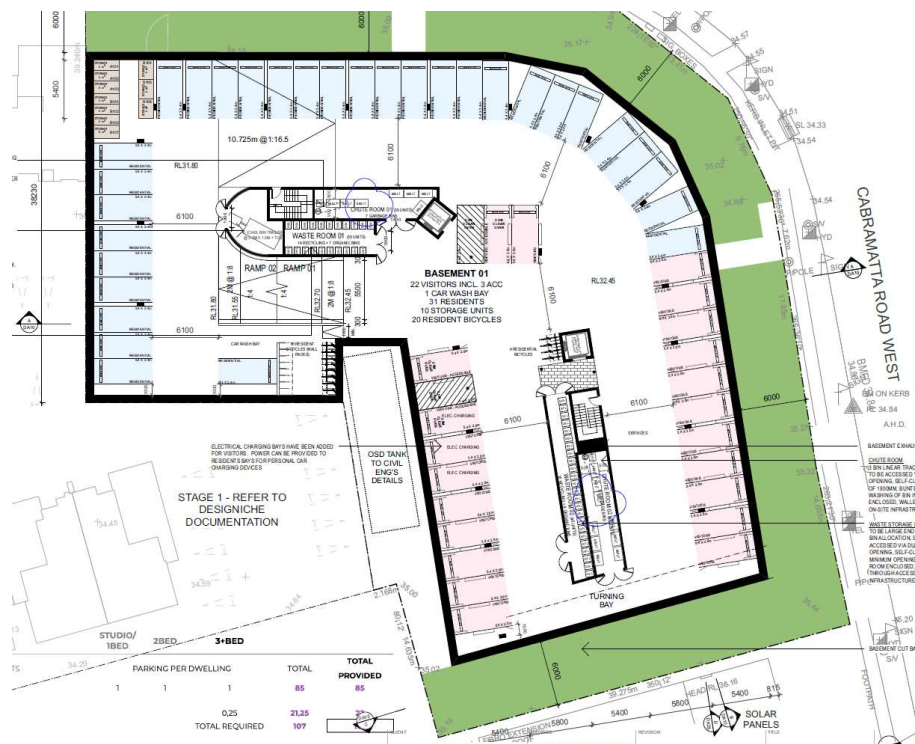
Proposed Basement 01 for Stage 2 Residential Flat Building.
